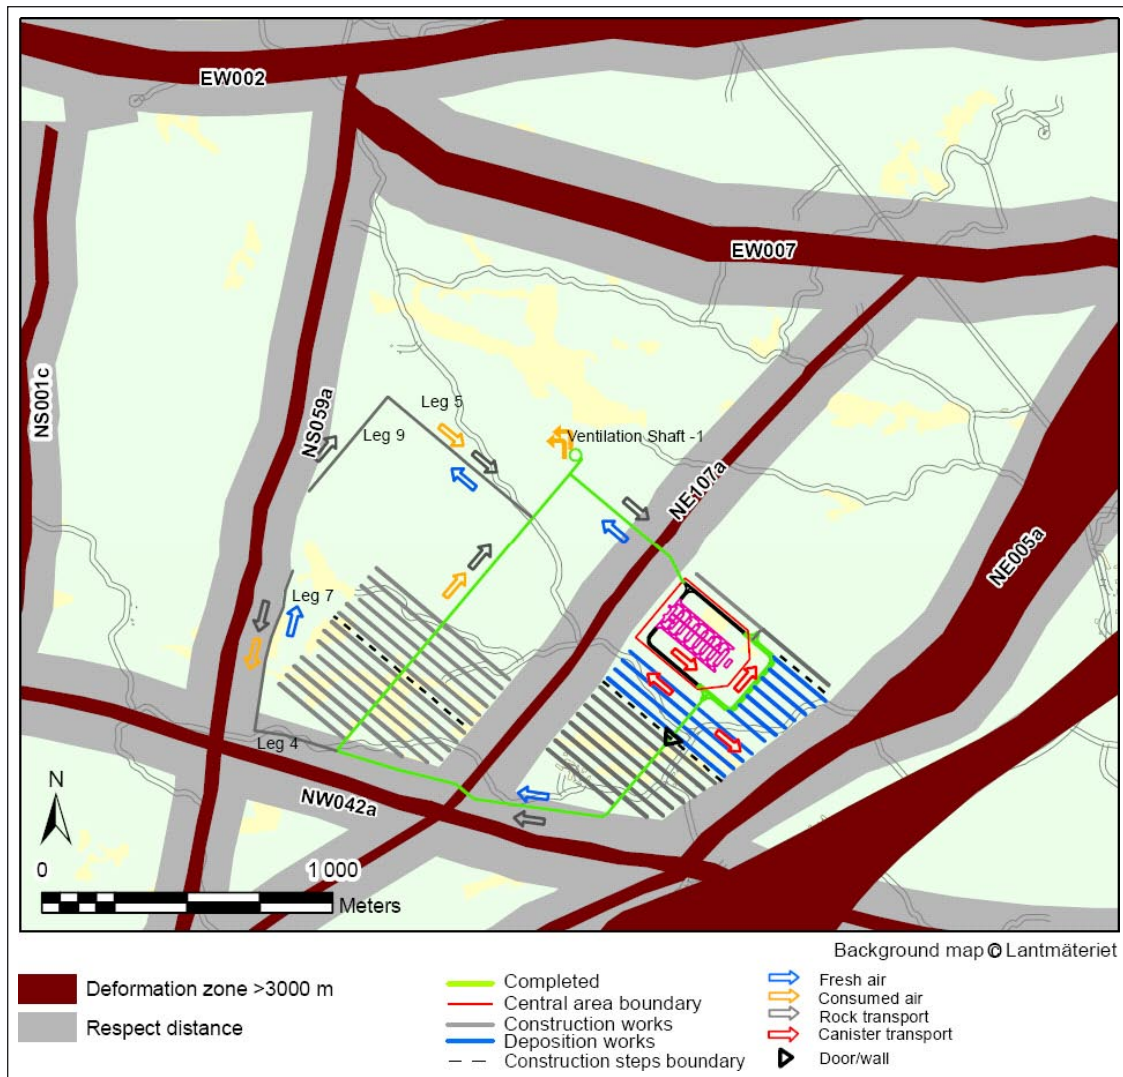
Deposition works in construction step 1 and excavation work in construction step 2–4.
